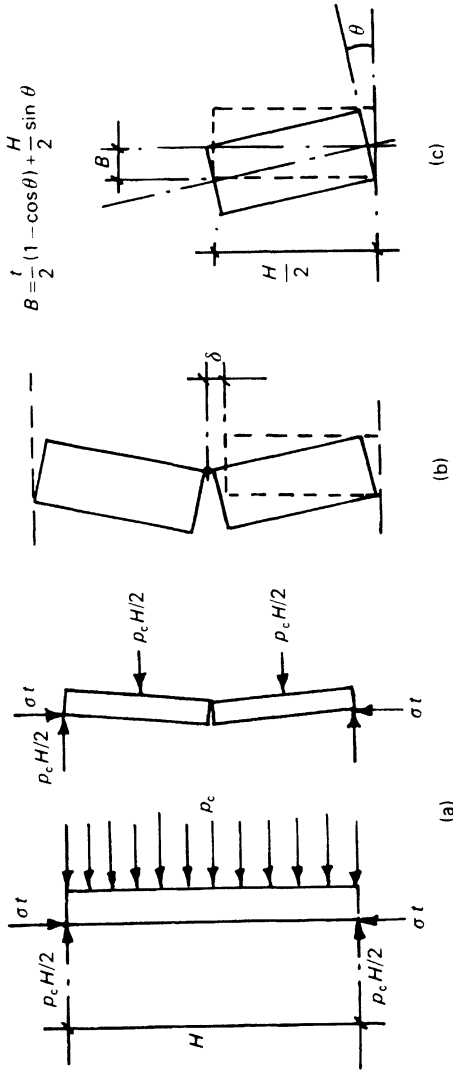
(a) Failure mechanism of laterally loaded wall with precompression. (b) Lift of half-height of wall at failure. (c) Rotation geometry of half-height of wall
